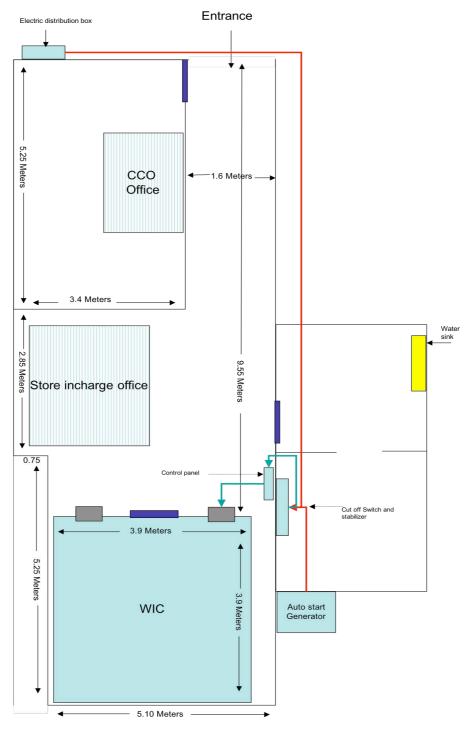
Layout of Mumbai cold store facility (ground floor) and suggested locations for the new WIF and WIC
